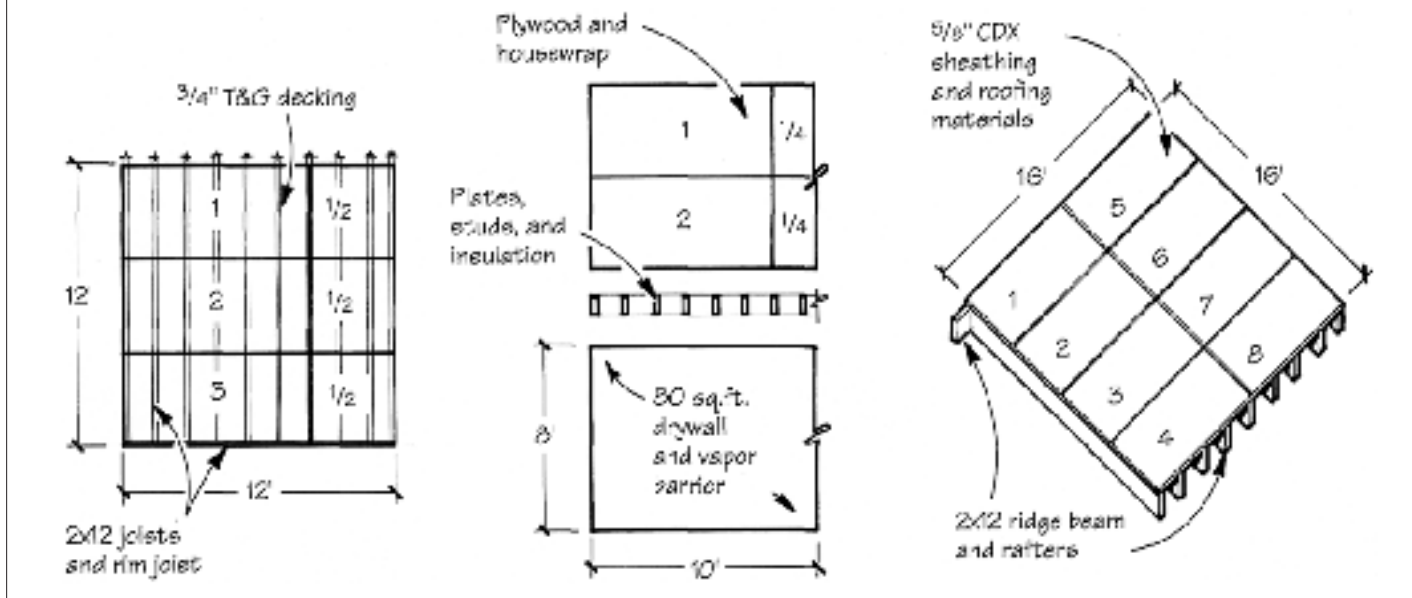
When building a unit-price assembly, use a schematic drawing to prevent omissions and to help calculate quantities. Shown here (left to right) are sketches for a floor system, exterior wall, and roof system.
